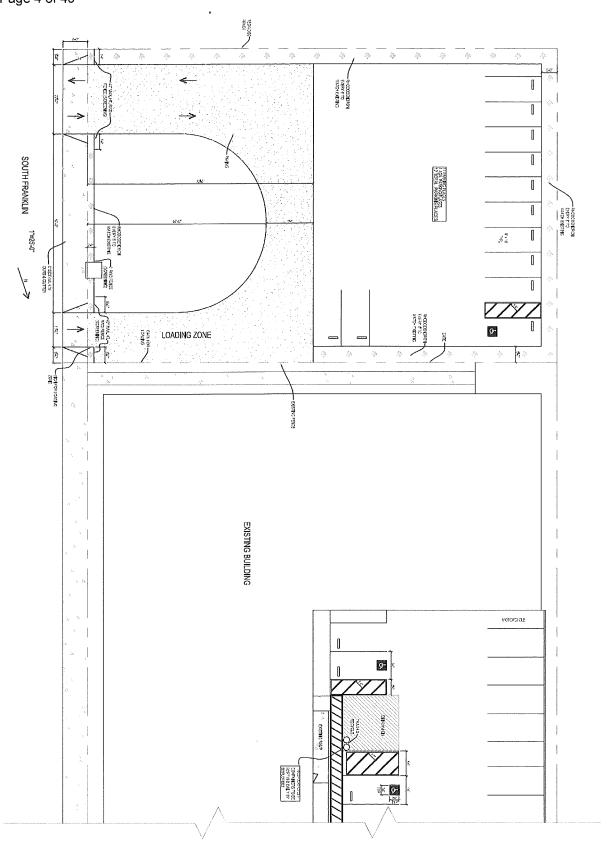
Partial Site Plan: Loading area and additional parking (Parcel 2 and a portion of Parcel 1).
